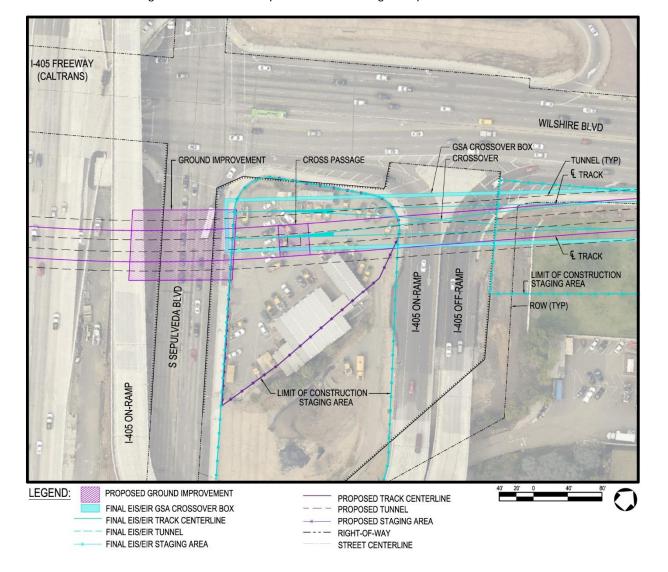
Ground Improvement Grouting at Sepulveda Boulevard
